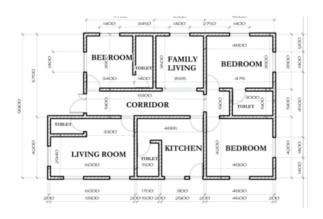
Sample contemporary building floor plan 1 (DK3Homes, 2022)
